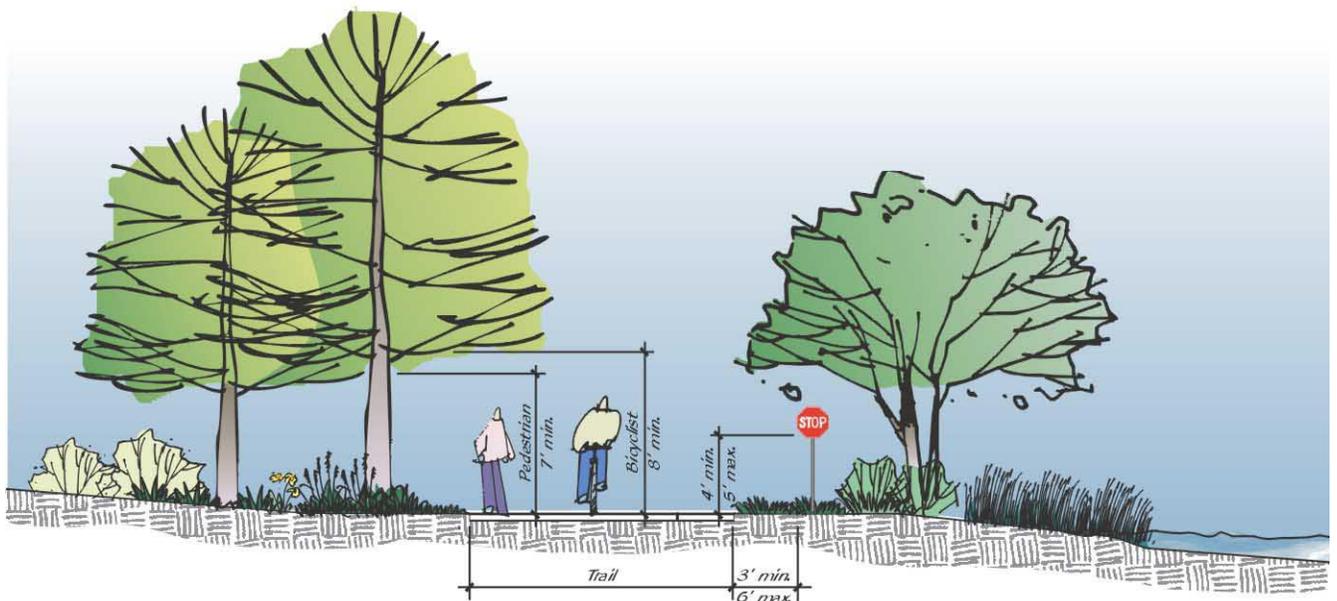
Primary Multi-Purpose Off-Street Trail Cross-Section
